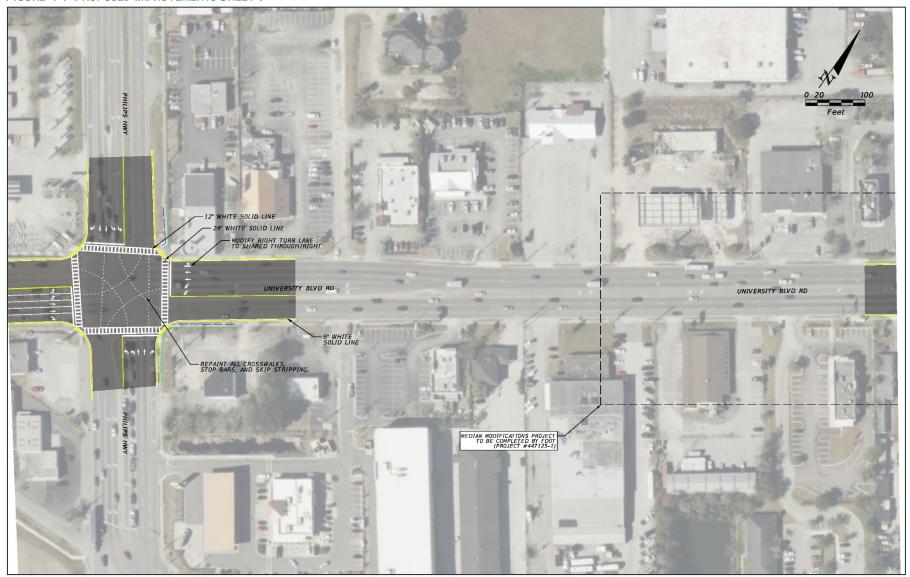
PROPOSED IMPROVEMENTS SHEET 8
